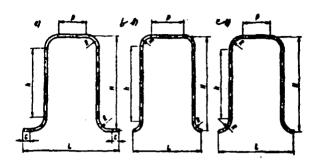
U-shaped compensators. a) bent; b) by the welded sharply bent offtakes; c) with welded offtakes.
